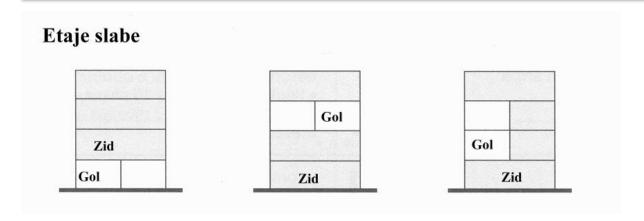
Buildings with "weak" levels (structural irregularity in elevation) Buildings that do not meet these conditions are considered without structural regularity, as the case may be, in plan or in elevation.
